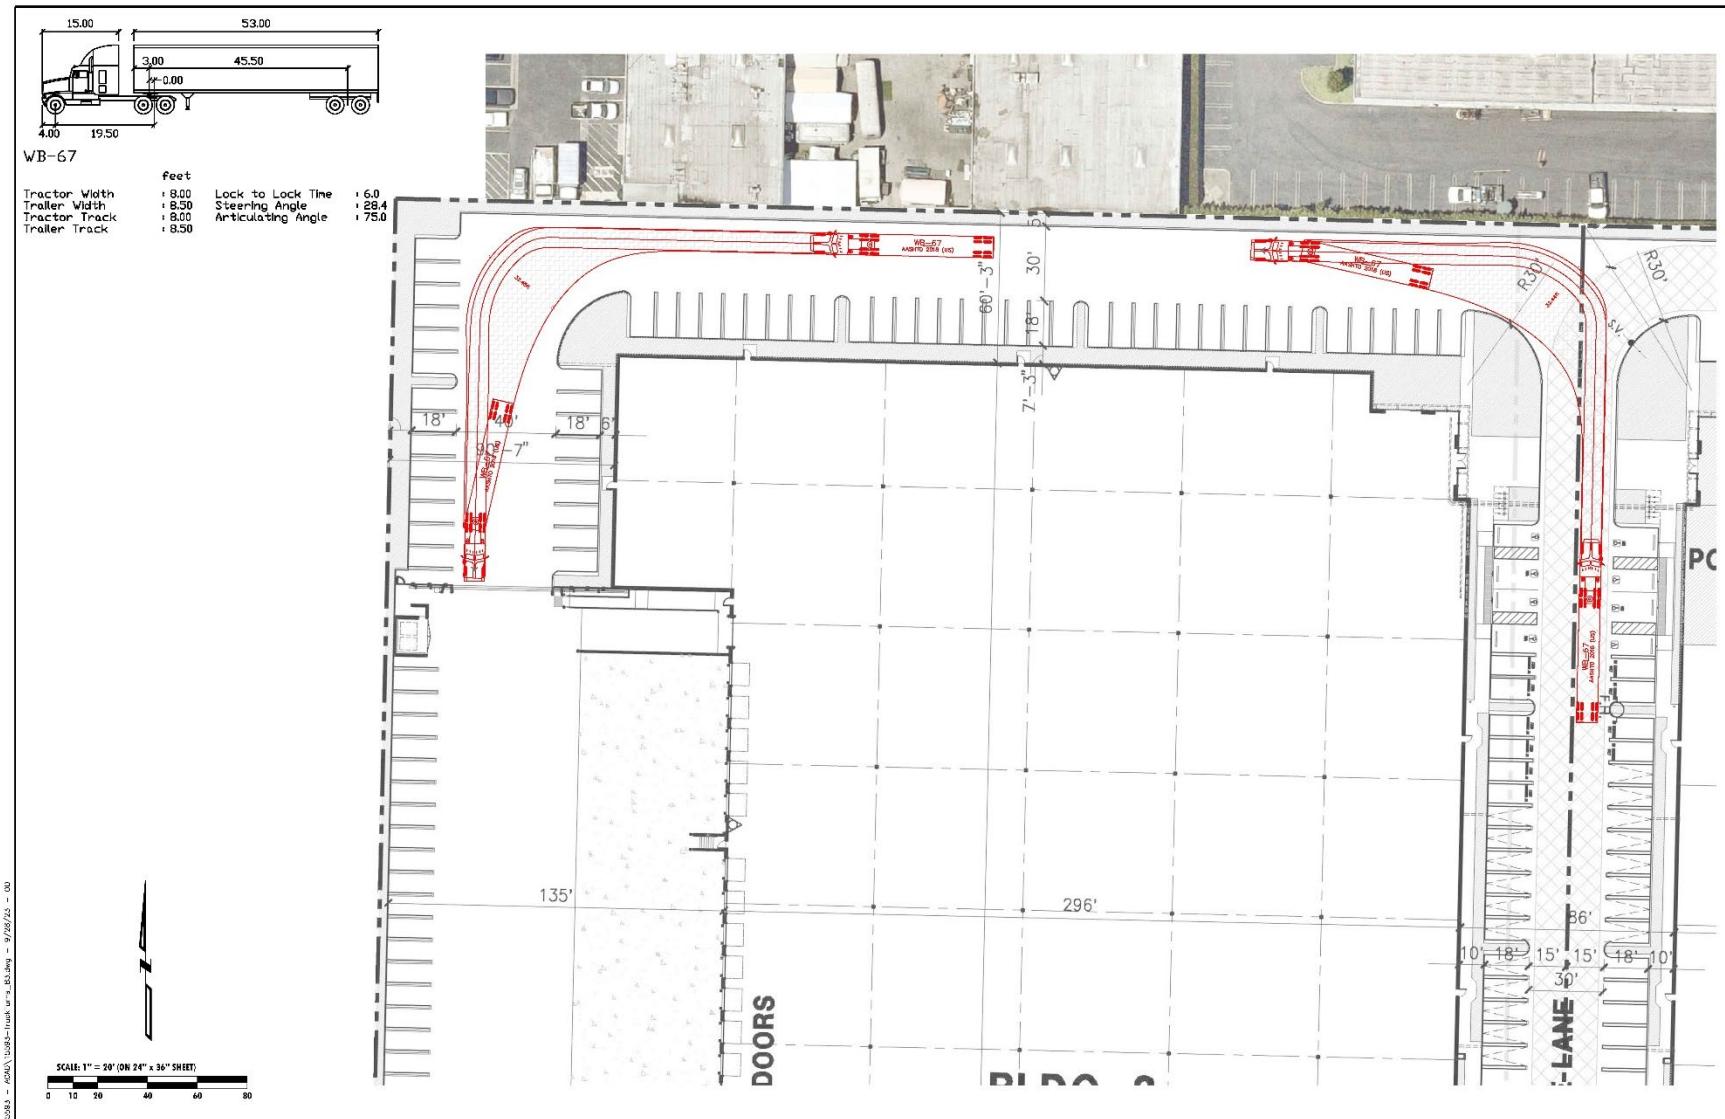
OUTBOUND ON-SITE TRUCK CIRCULATION VIA DRIVEWAY 2
